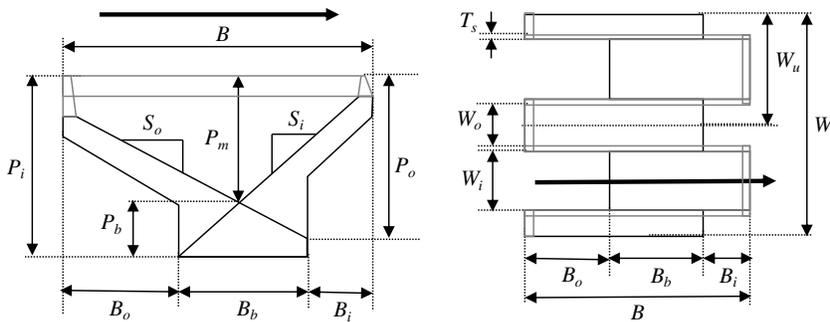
Geometric parameters of a PKW – Typical cross section (left) and plan view (right) (Pralong et al., 2011a)
